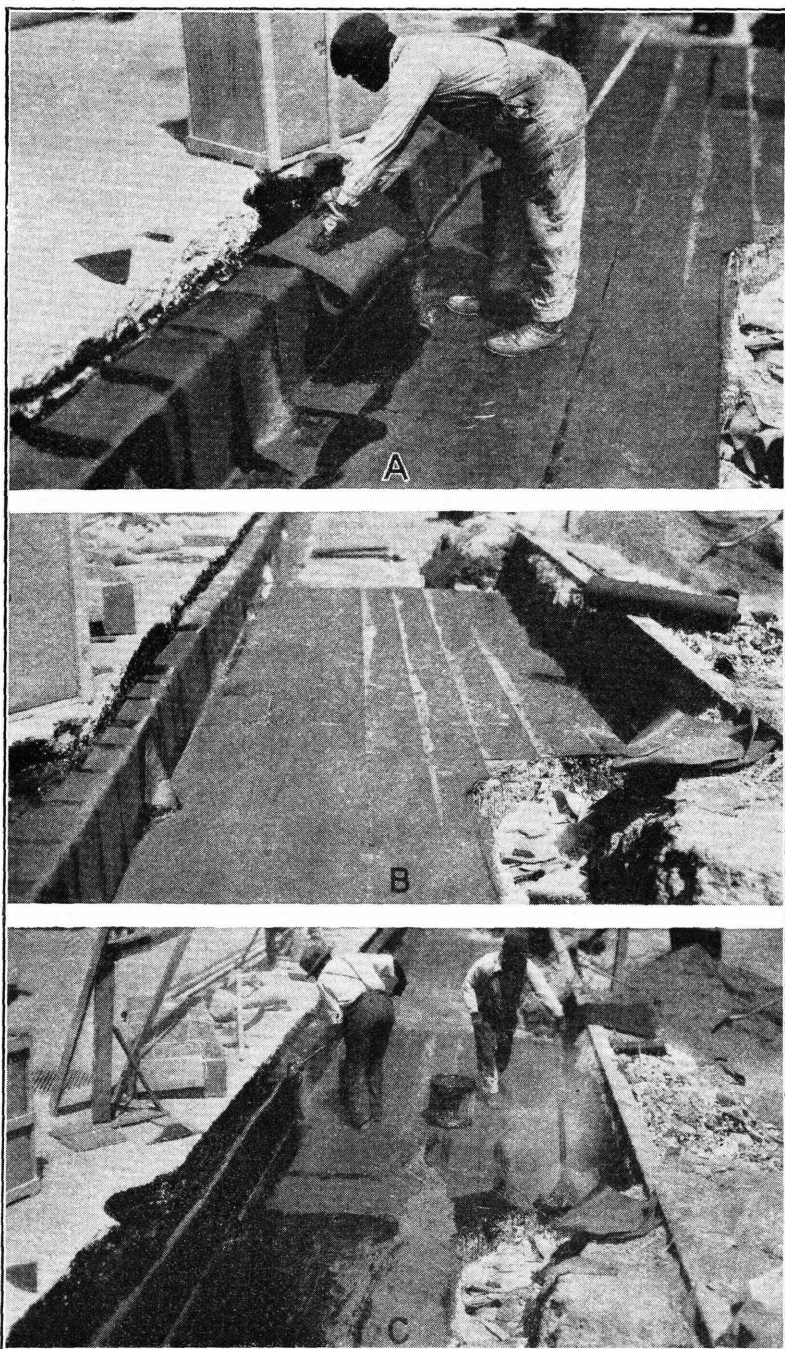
Membrane waterproofing: A, Cutting and applying vertical sheets to lap about a foot on the floor sheet; B, a completed layer with felt thoroughly stuck to felt; C, applying the heavy top-mop coat
